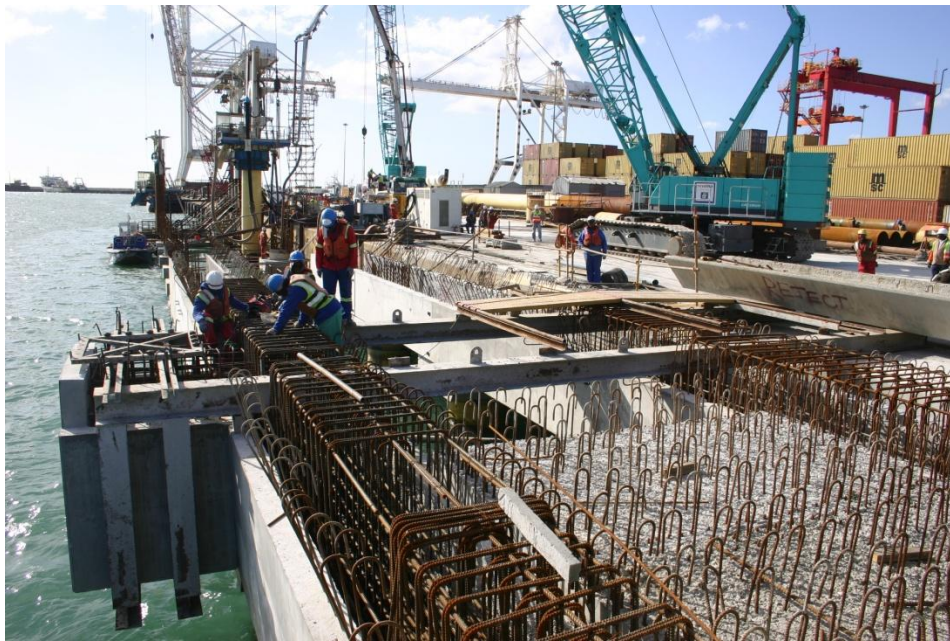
Cape Town Harbour Extension – fixing of steel prior to casting of in-situ concrete
